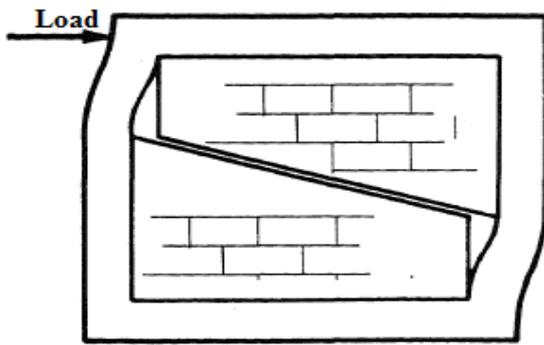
Mechanism of shear failure of brick wall with frame^[1]
